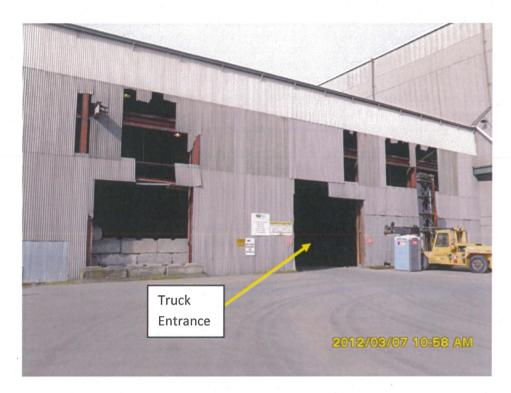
View of the building which houses the contaminated materials brought to the facility. Note the truck entrance to the building.
